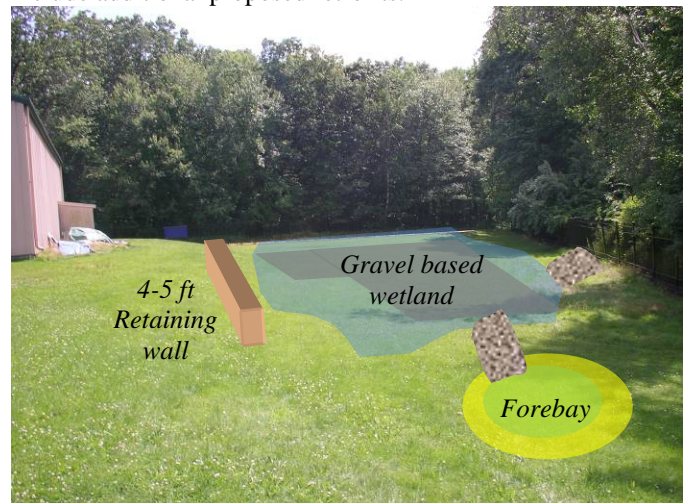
Gravel based wetland system with underground chambers, pretreatment sediment forebay, and retaining wall.
